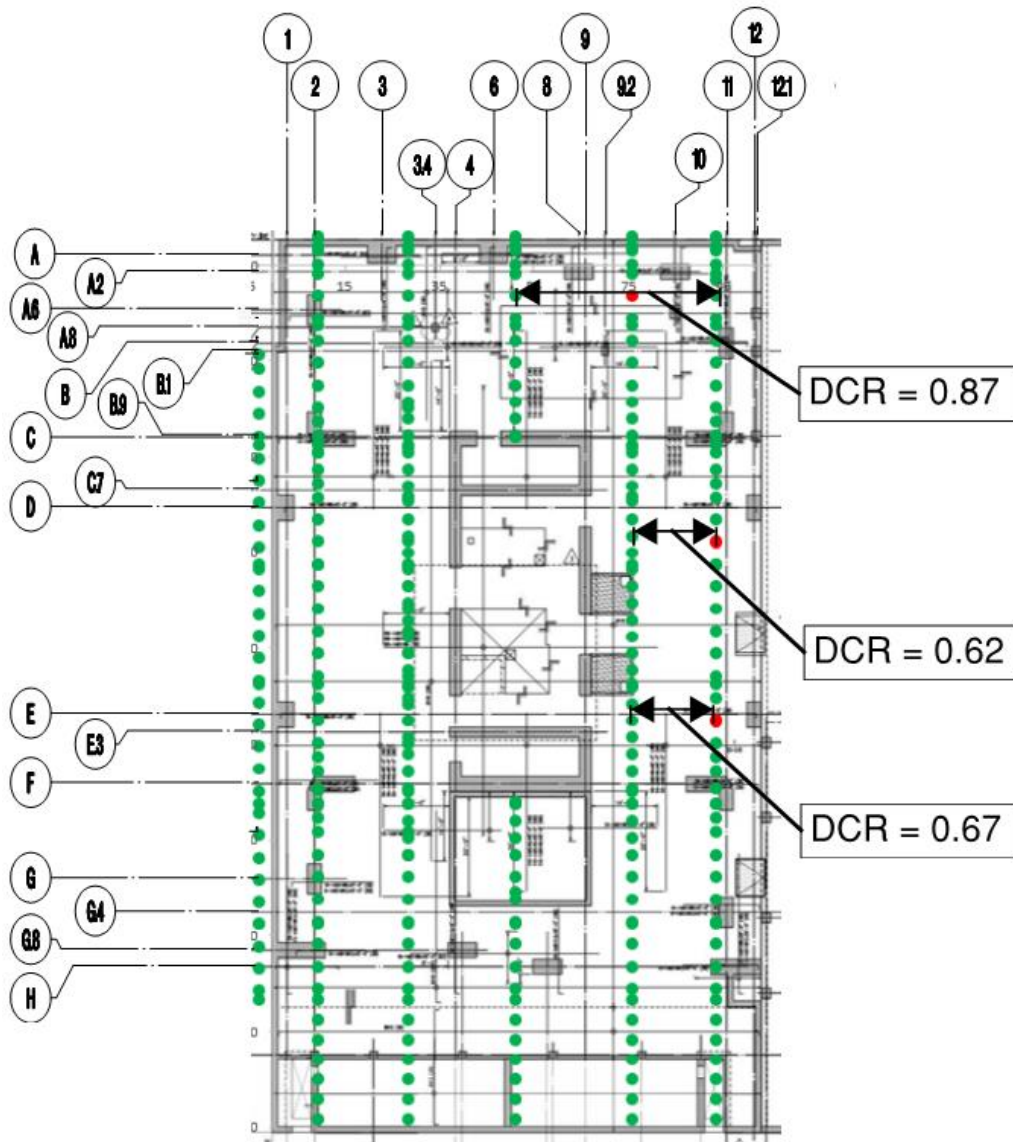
DCR Plot for North-South Top Reinforcement Design Strips for Gravity Load Envelope with Jacking Loads
